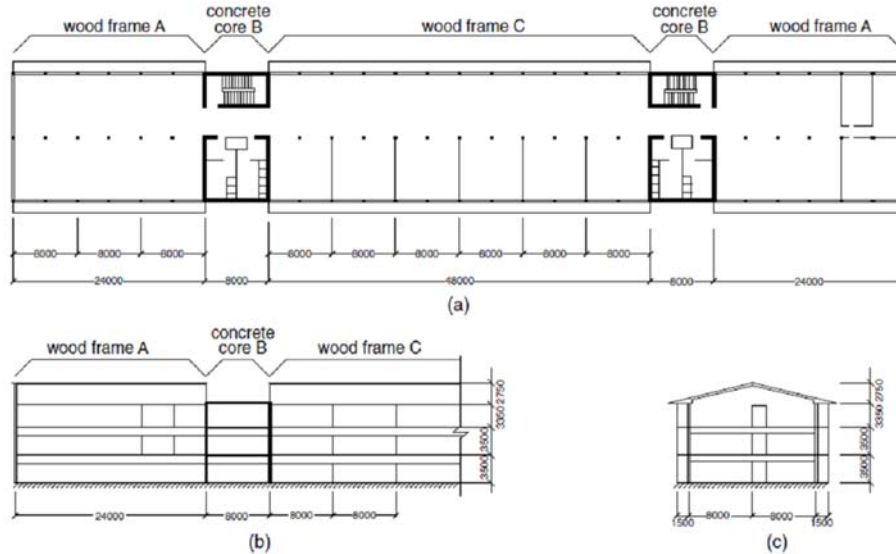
Prototype school building presented in 2012 AIJ. ((a) plan, (b) elevation, (c) side view, Wu et al., 2018)
